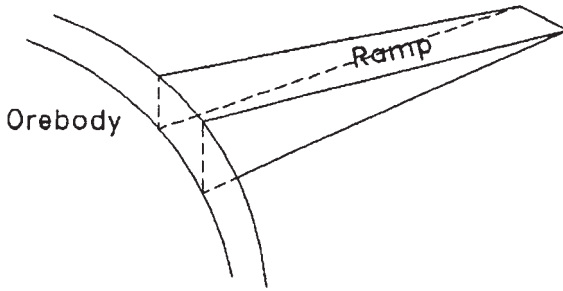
Isometric view of the ramp in waste approaching the orebody.
